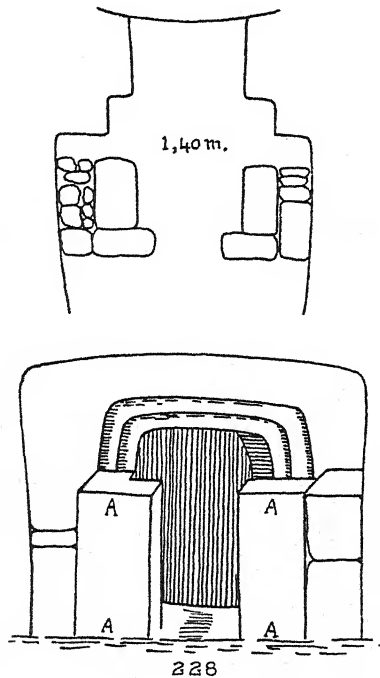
Plan and elevation of entrance to tomb, Thapsos. (After Orsi, *Mon. Ant.*)
